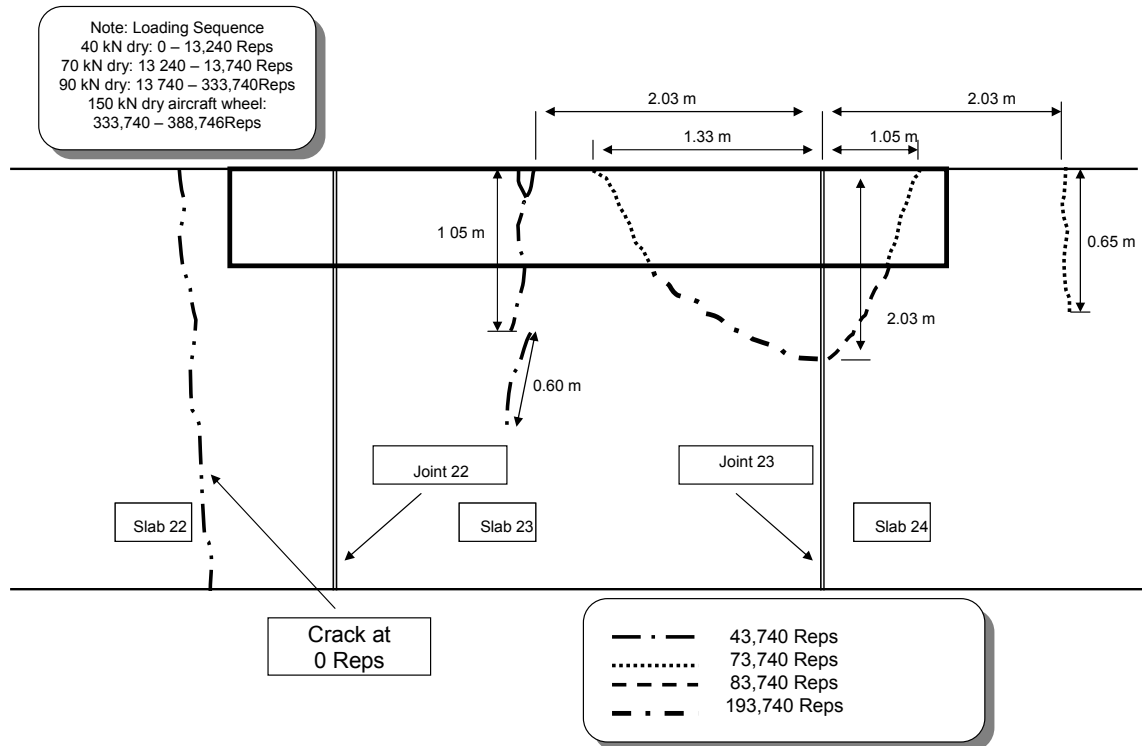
Crack pattern in slab (537FD) after fatigue damage load application.(2)
